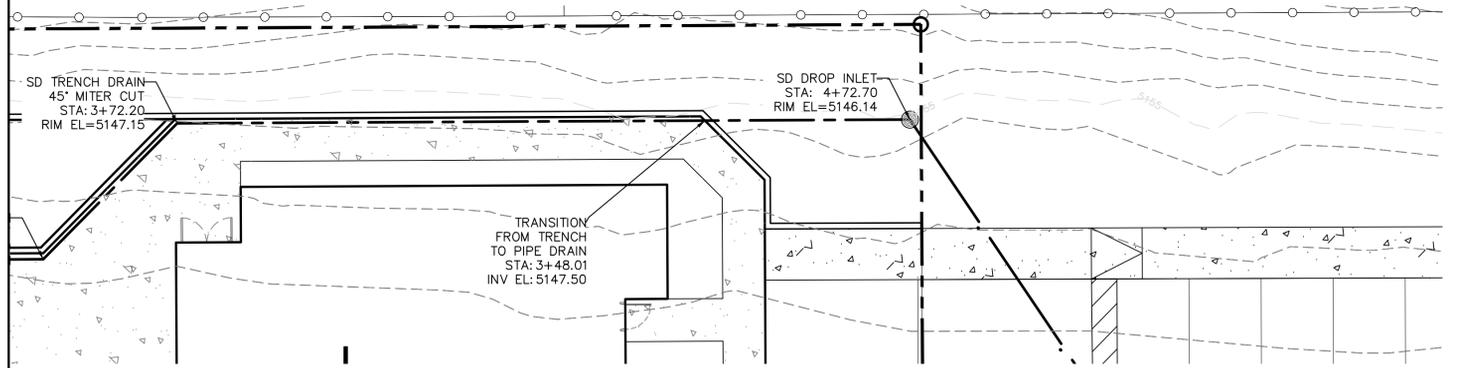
DETAIL A-A - ON-SITE STORM DRAIN SYSTEM
